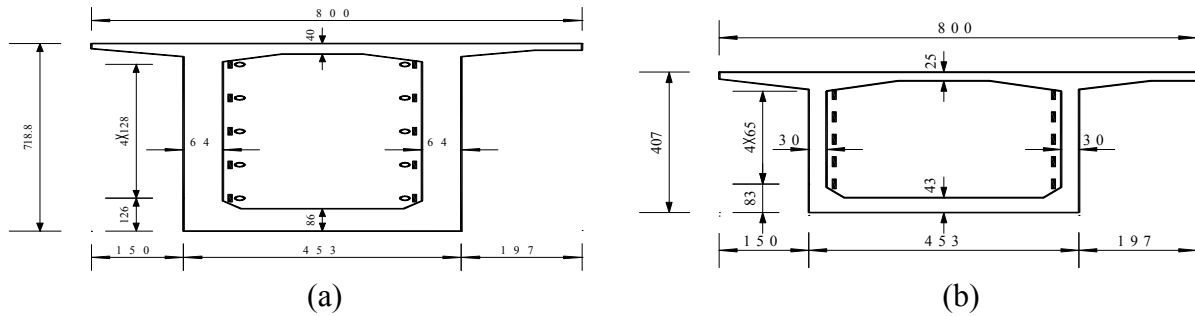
Layout measuring points of stress and strain: (a) Pier box girder, (b) Box girder of 1/2 cantilever span
